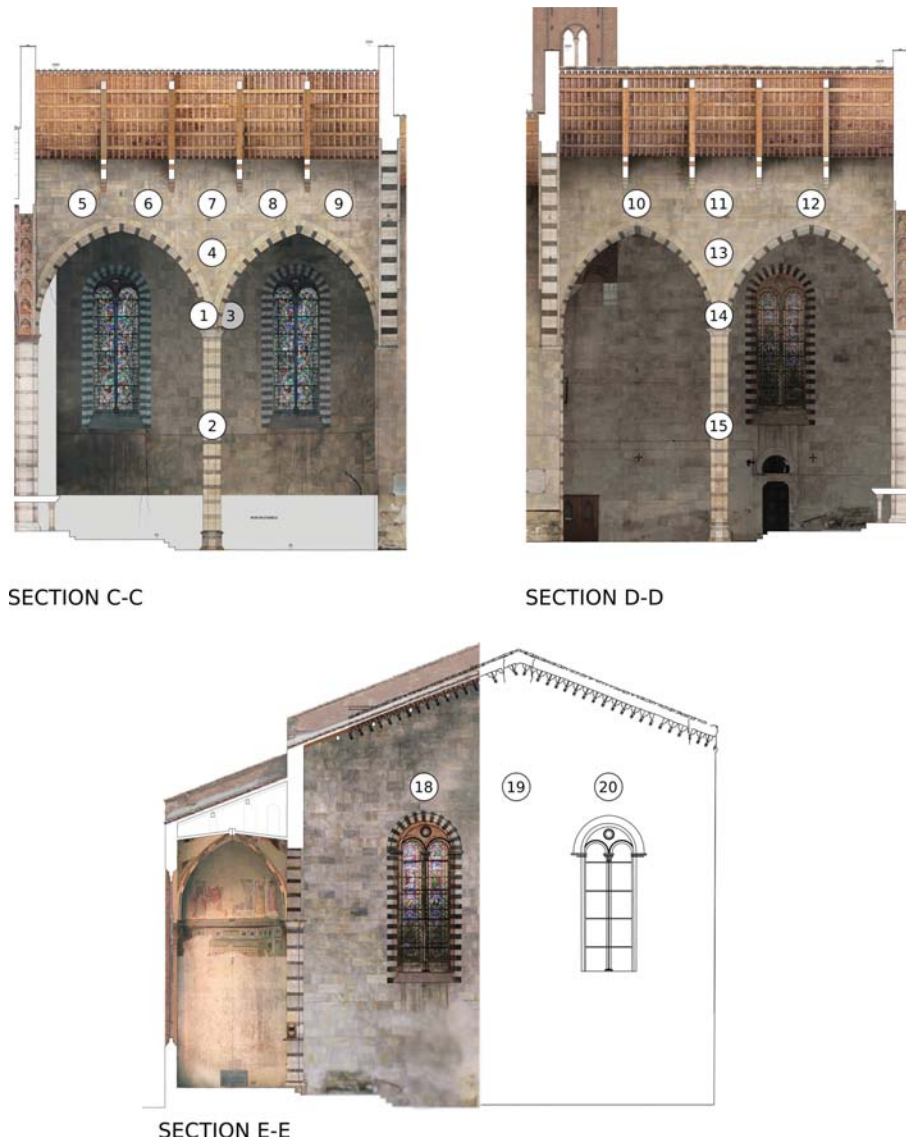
Sensor positioning. Section CC (south partition wall), section DD (north partition wall) and section EE (south transept wall). White portions were impossible to photograph.
